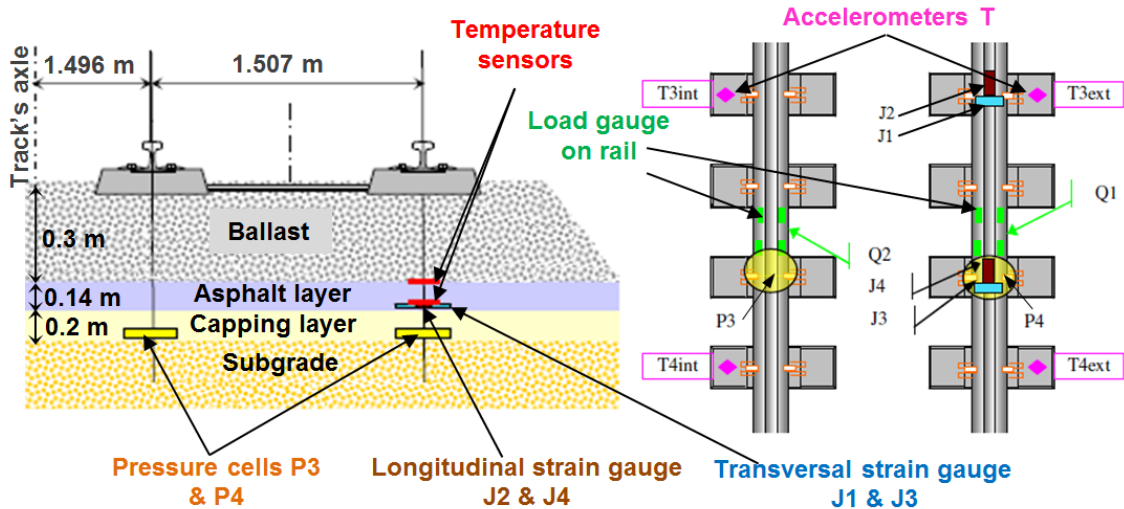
Instrumentation of the EE HSL bituminous track: Transversal plan (left) and top plan (right) (Not in scale) (Adapted from an internal document of the SNCF)
